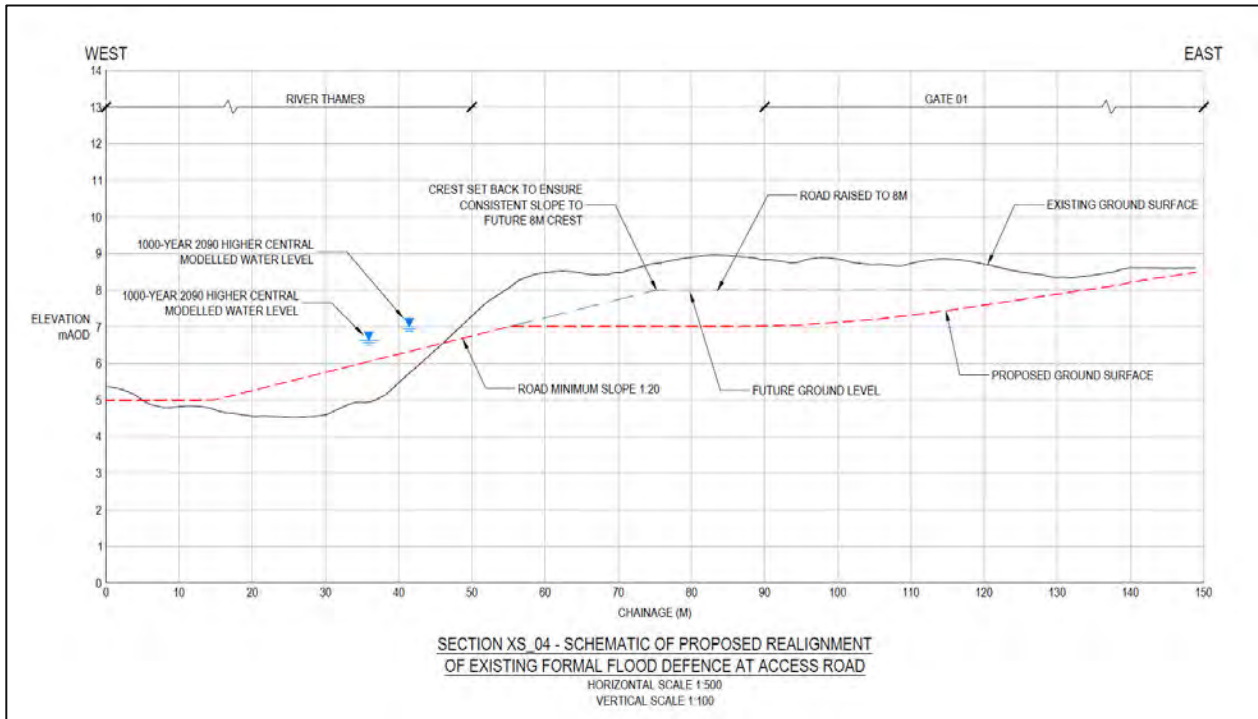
White's Jetty cross section showing the proposed initial and phased defence crest level raising, cross section location shown on the plan on Figure 4 -11.
